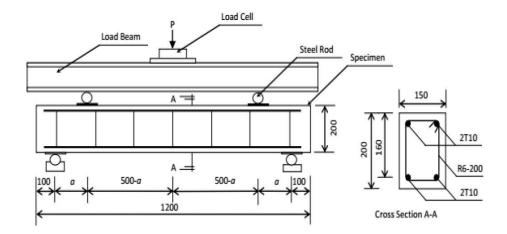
Typical beam and test setup (Lian, et al., 2013).
